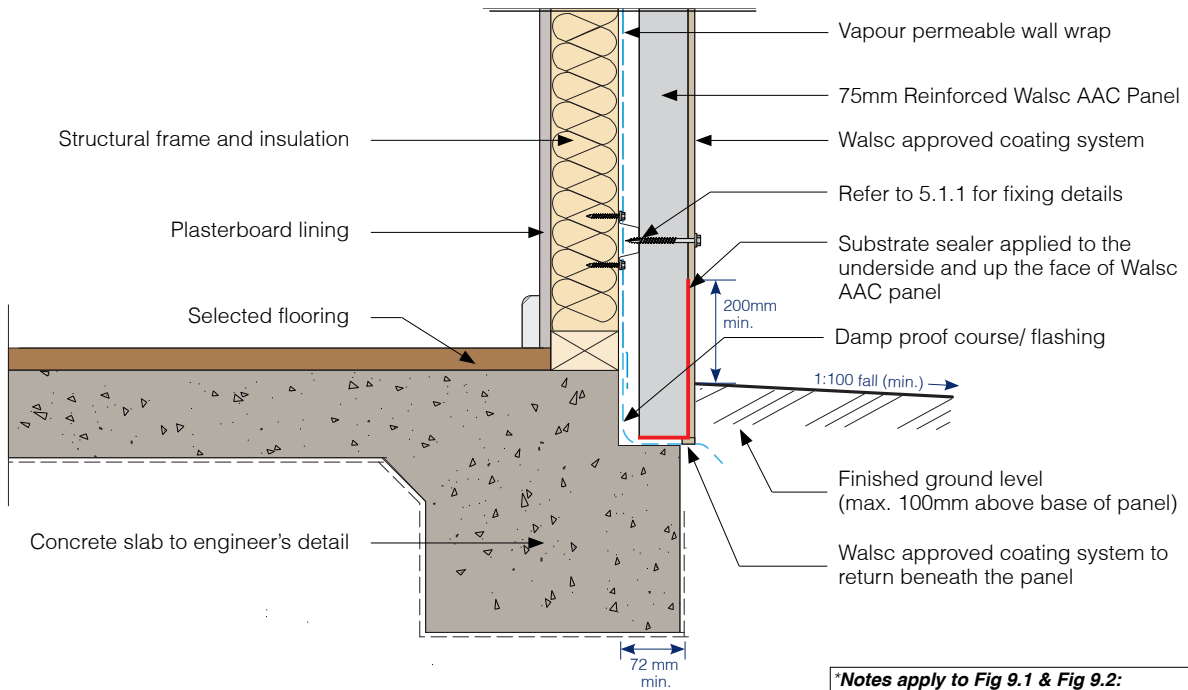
Junction to Panel Below Finish Ground Level Detail 1
